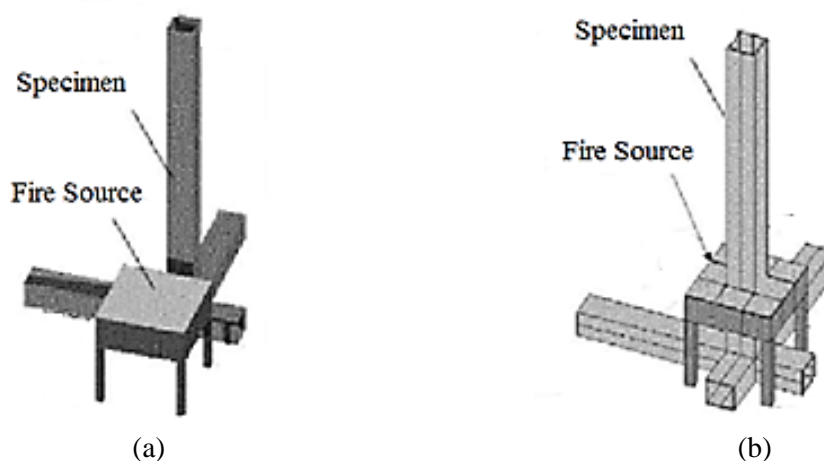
Test setups: (a) steel column subjected to adjacent fires; (b) steel column surrounded by localised fire (Kamikawa et al., 2003)
